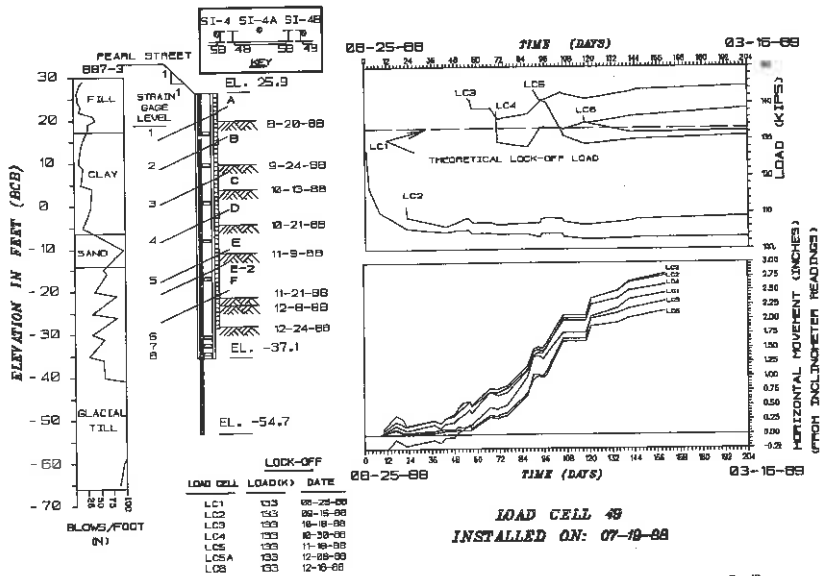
HORIZONTAL MOVEMENT AND LOADCELL INSTRUMENTATION FOR SOLDIER PILE 49
